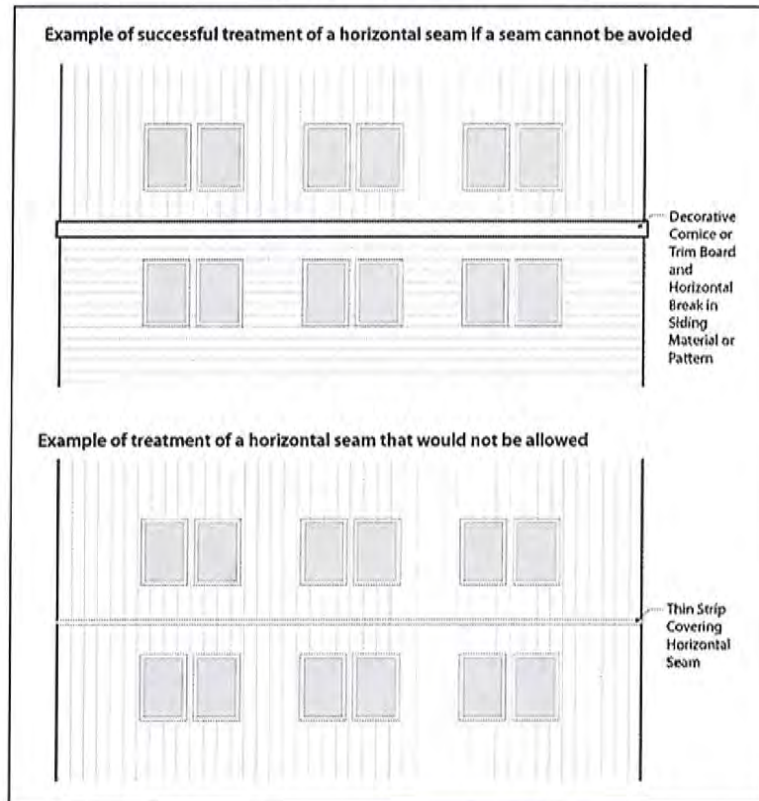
Exterior Walls – Horizontal Seam Treatment
